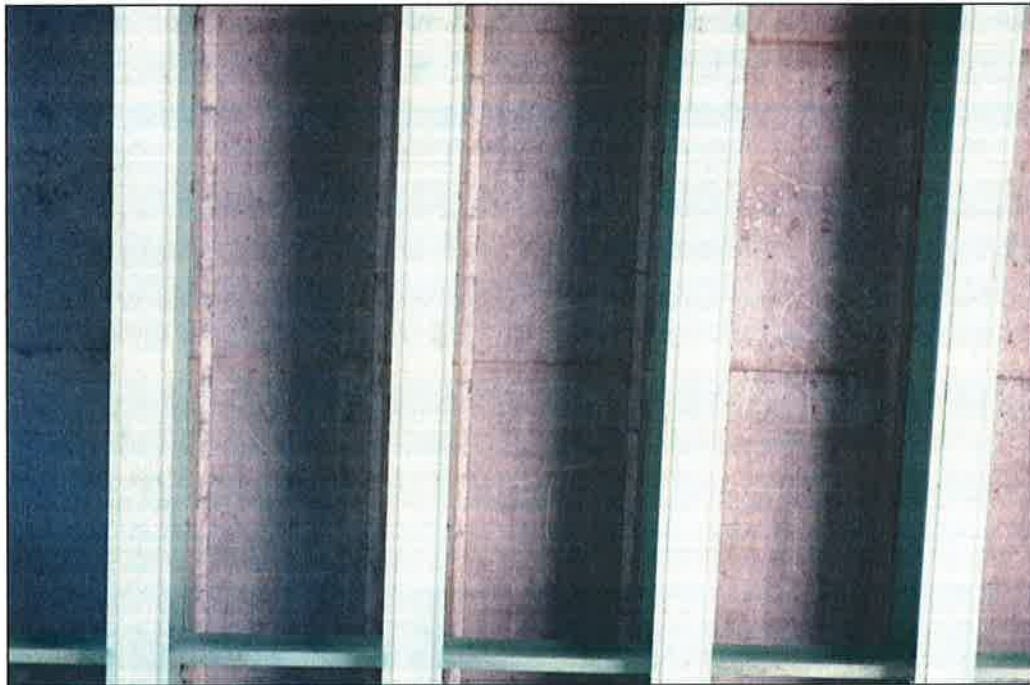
Typical Condition of Soffit (Bent 85-86) (fair condition – stained and unstained cracking, delaminations and patches)
